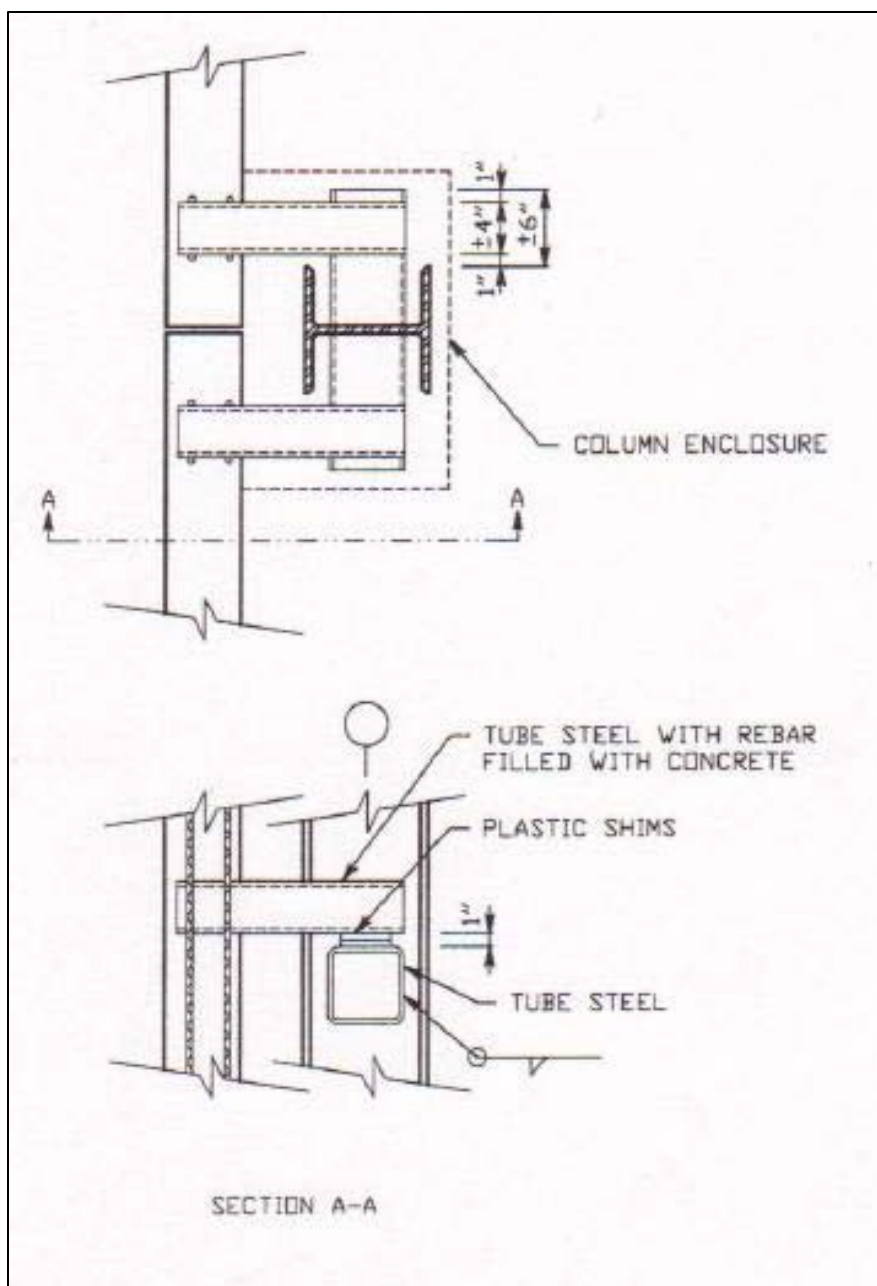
Plan view and section of the load-bearing panel connections selected. Plastic shims are used between the tube steel supports which protect the system from transferring energy. Image courtesy of Nitterhouse.
